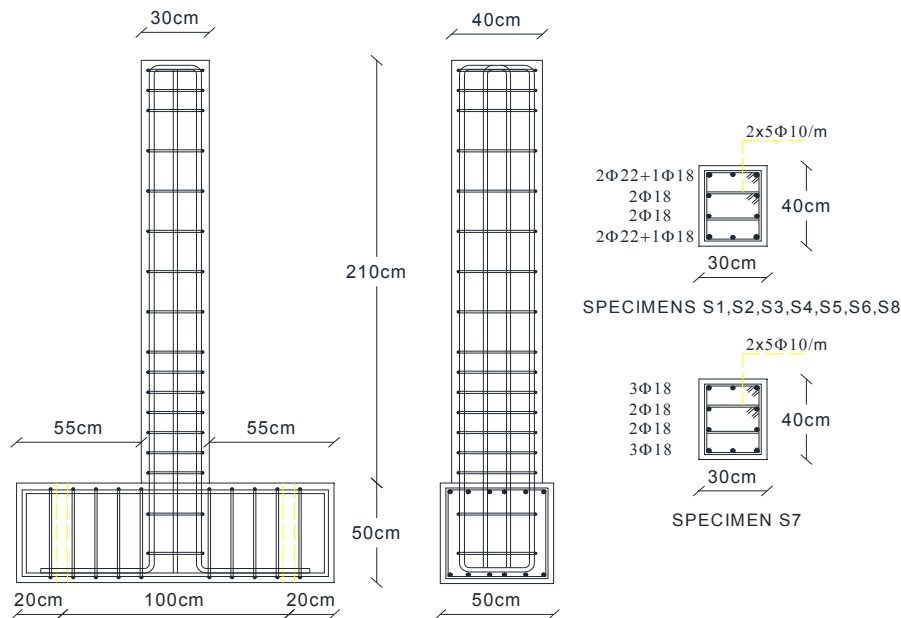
Details of tested scaled bridge columns <sup>[1]</sup>
